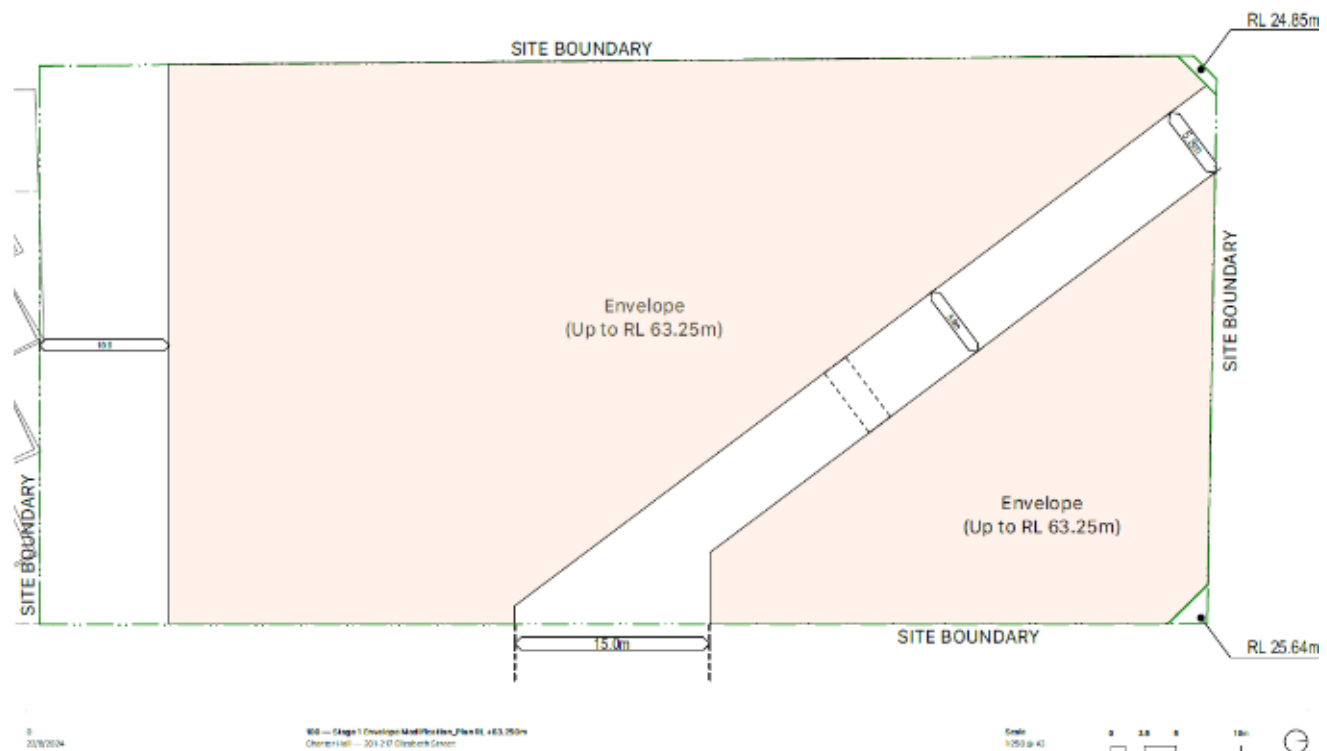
| Proposed podium envelope (up to RL 63.250) (Source: Ethos Urban modification plans)
